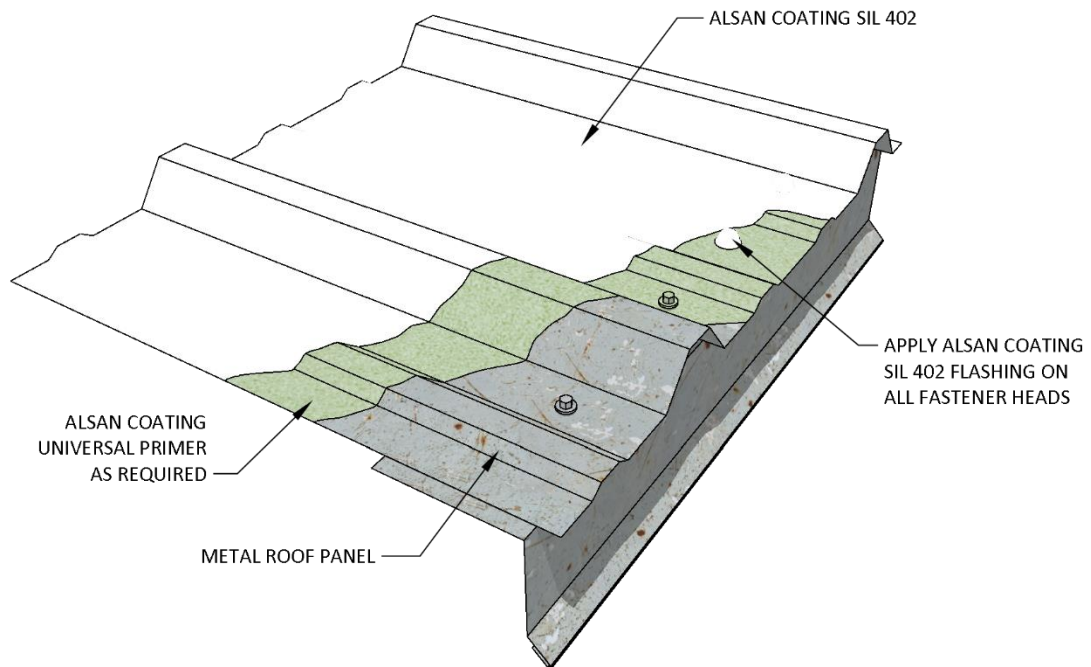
Silicone Roof Coating Over Metal Lap Panels, Edge
